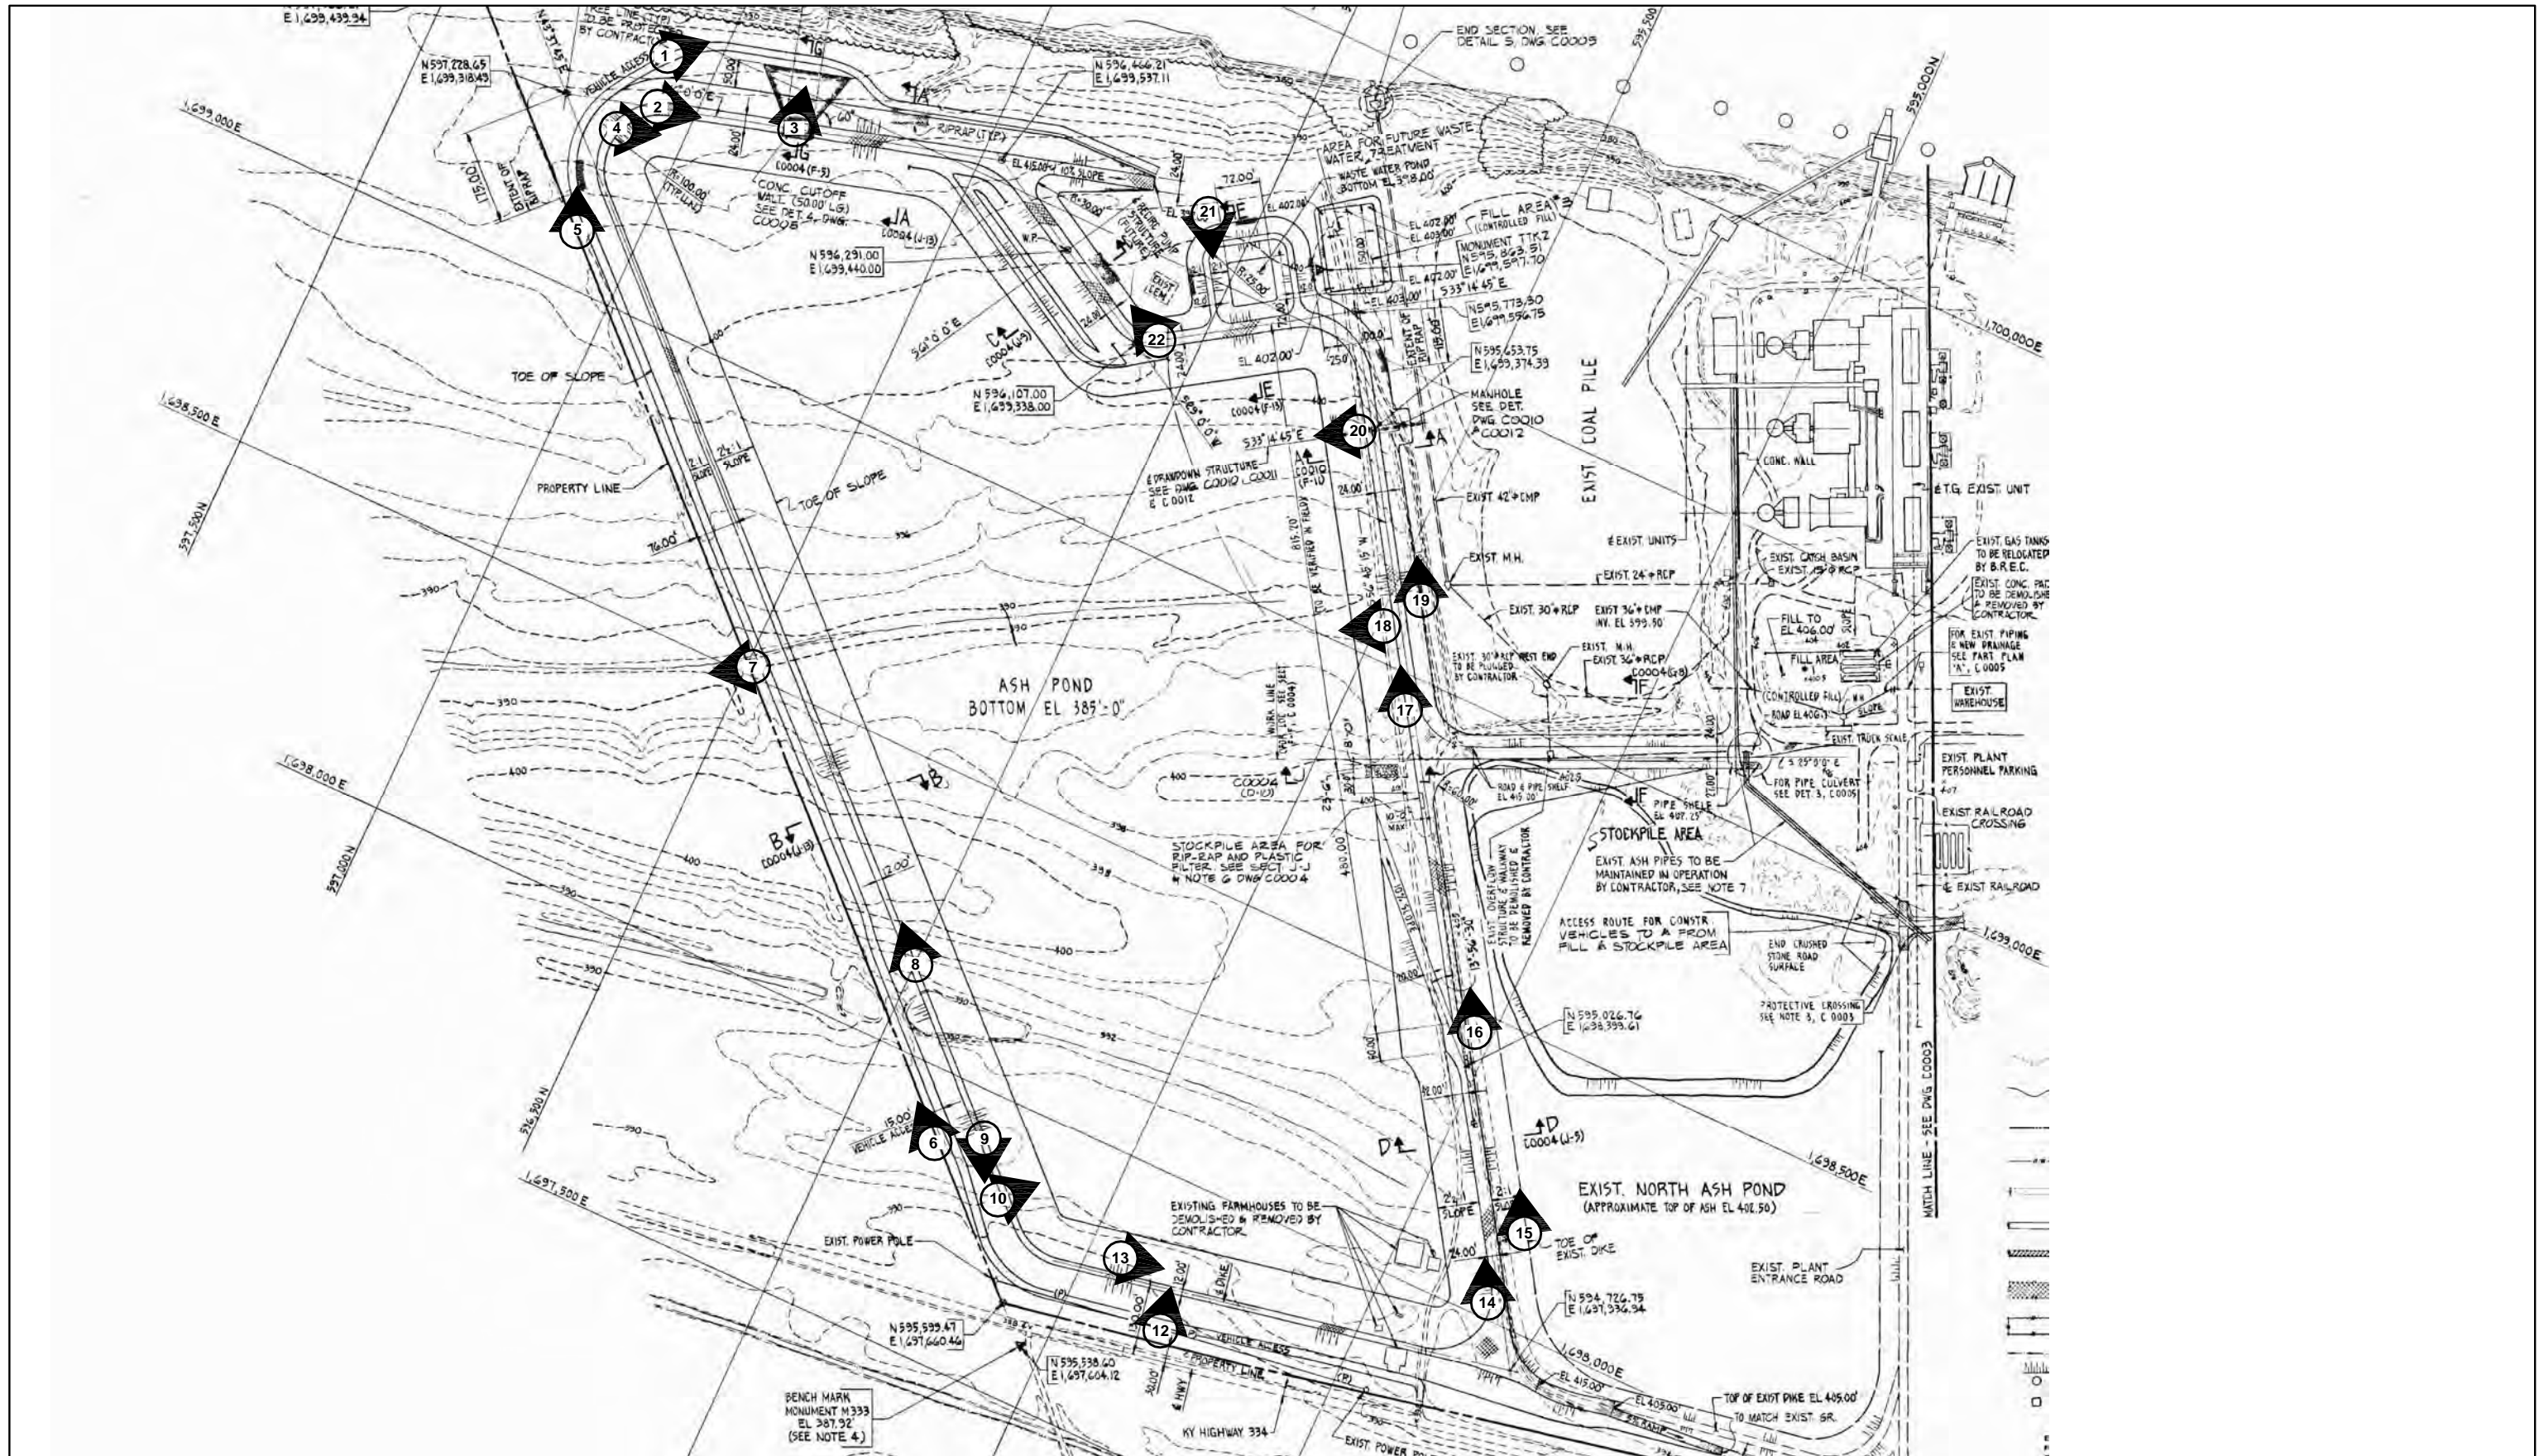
IMAGE REFERENCE: BIG RIVERS ELECTRIC CORPORATION COLEMAN POWER PLAN, PLAN SITE GRADING, ASH POND AREA, BY BURNS AND ROE, INC., MAY 24, 1979
